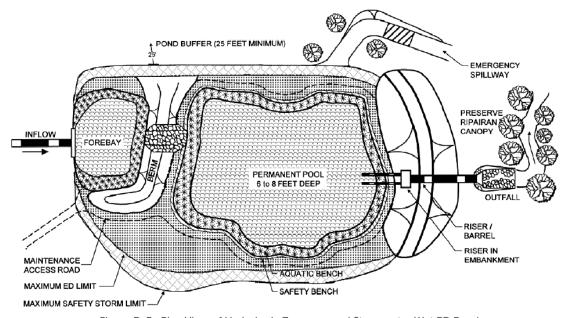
Plan View of Hydrologic Zones around Stormwater Wet ED Pond
